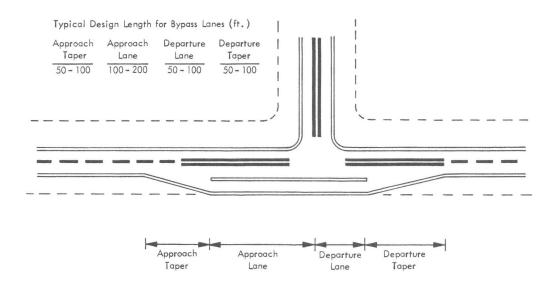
Plan View of Typical Intersection with Shoulder Bypass Lane
